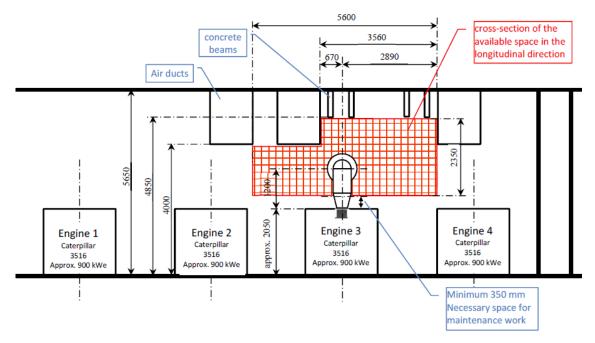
Dronninglund District Heating Plant, Engine room layout - Cross-sectional view
